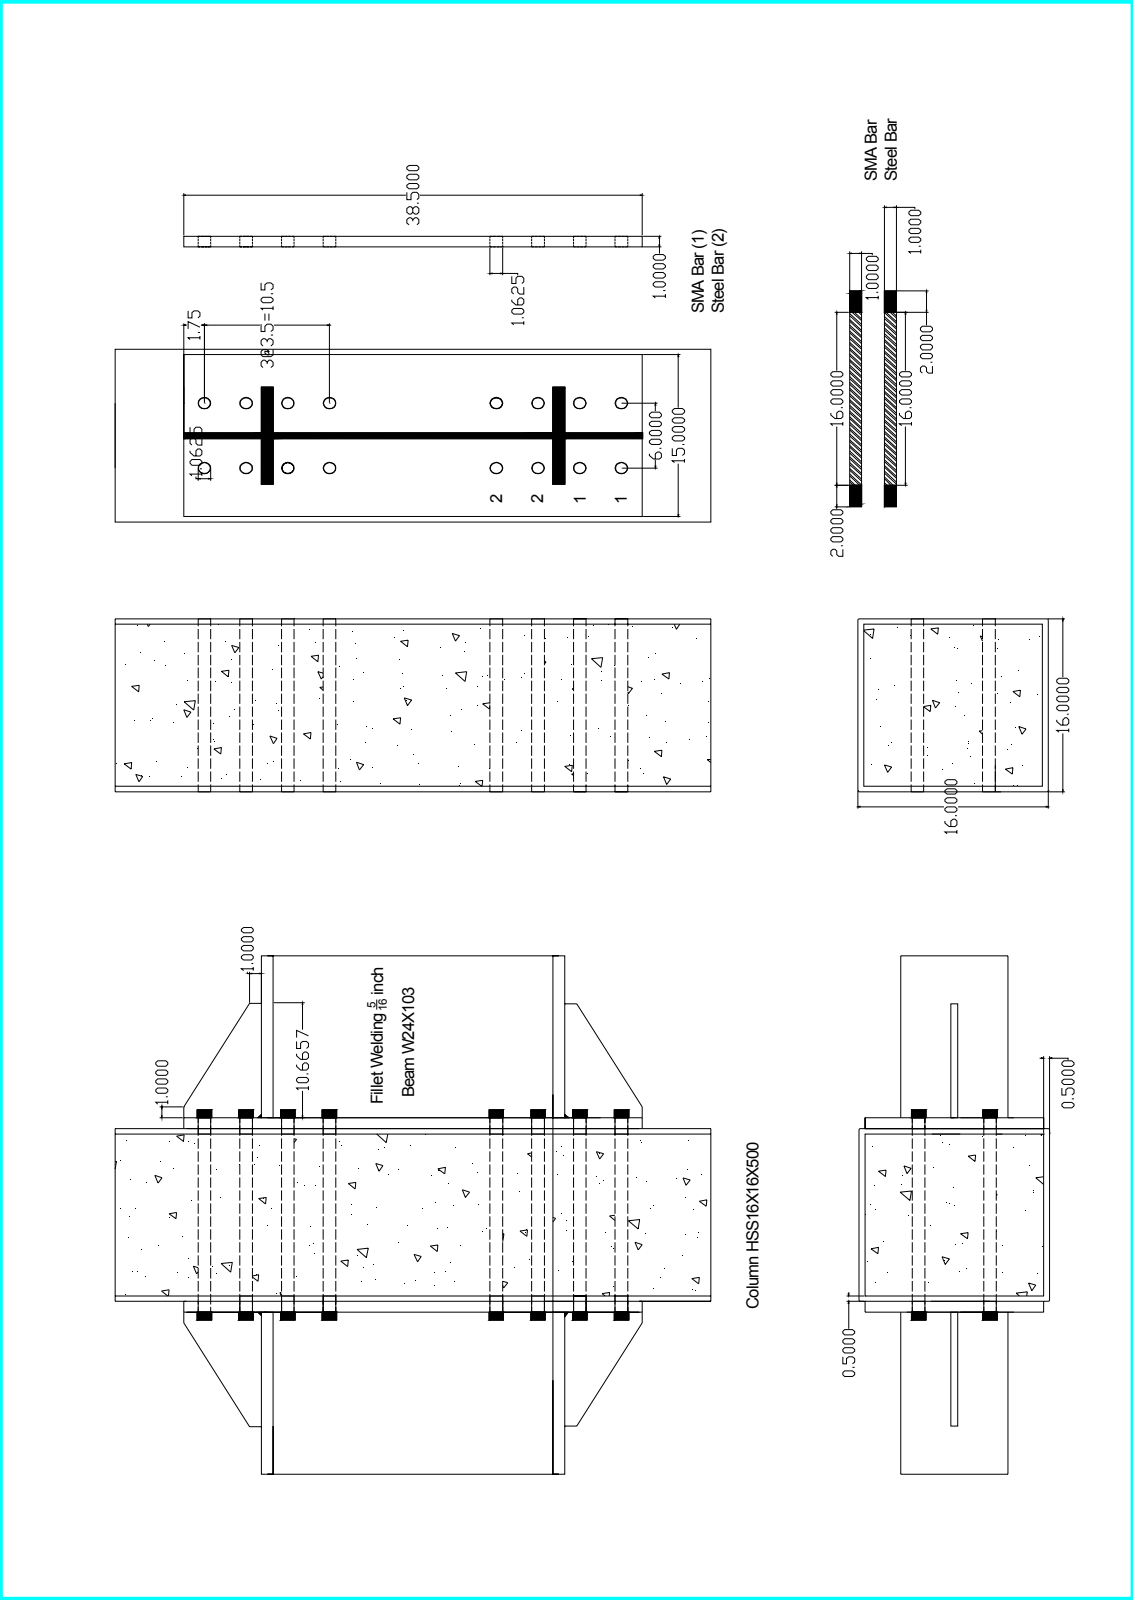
Schematic drawing of RCFT end-plate connection details
